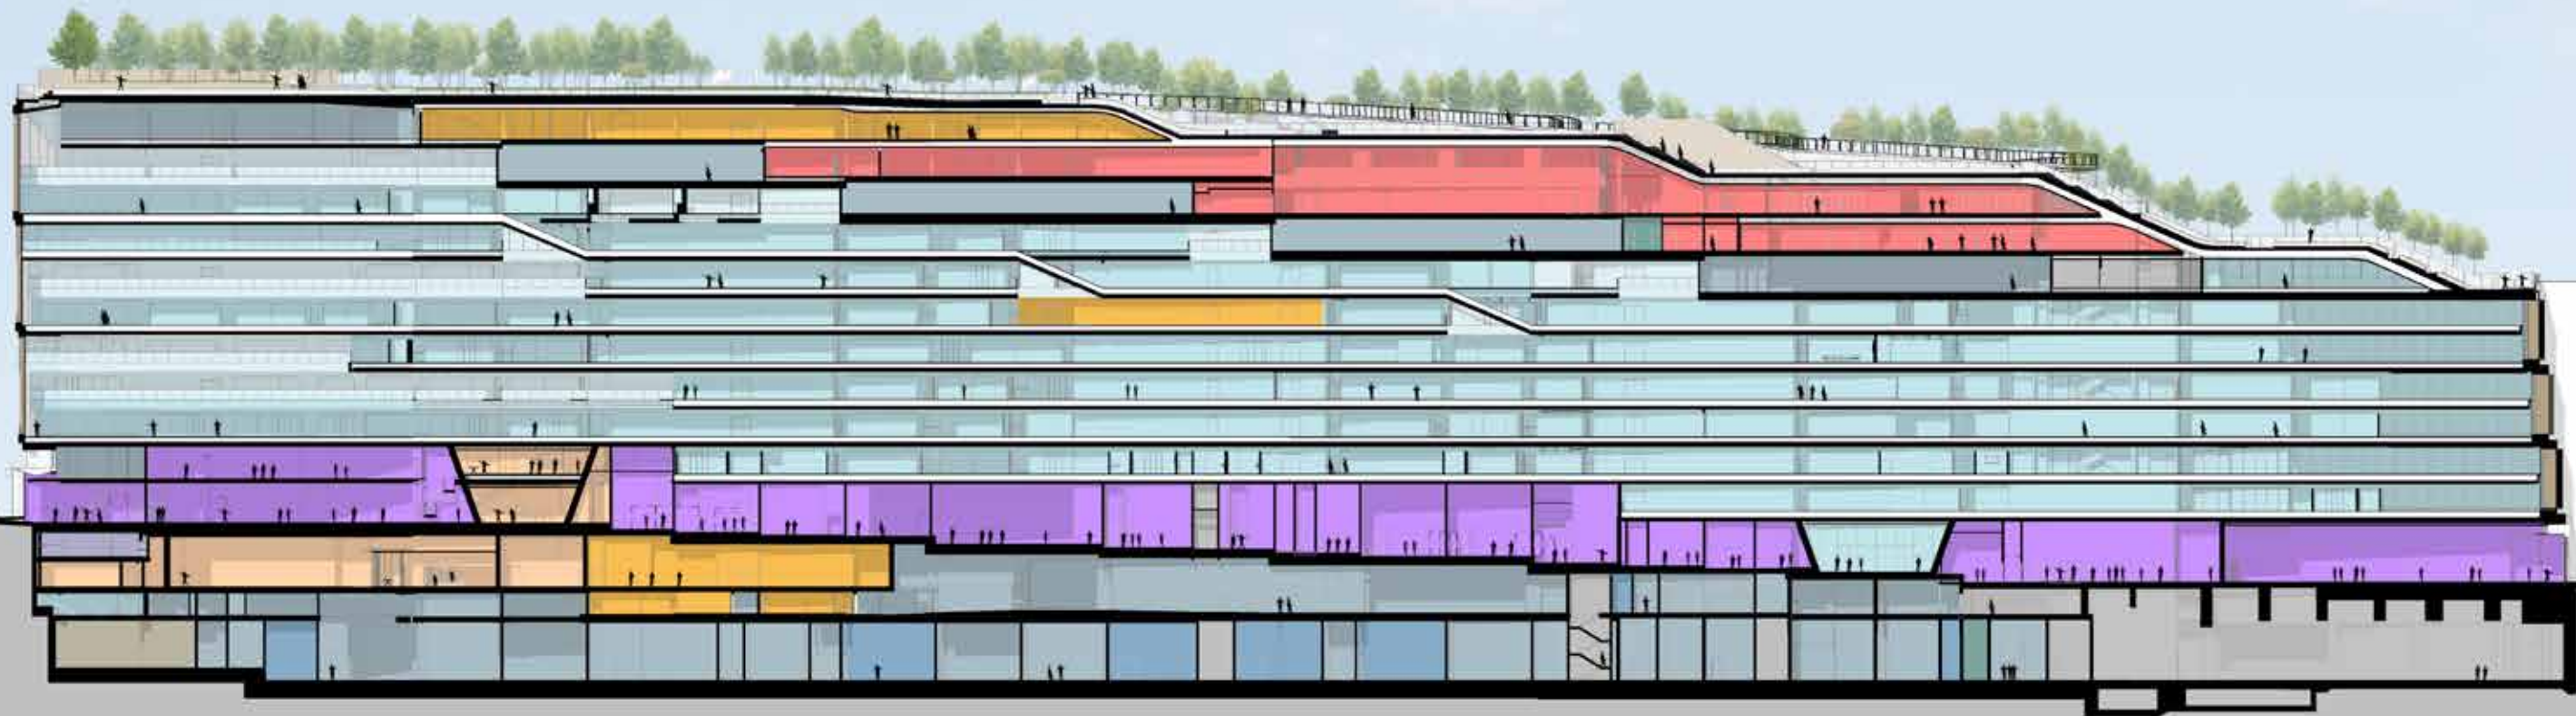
Long section along King's Boulevard, looking east. Retail frontage is shown in purple and demonstrates the slope down from Goods Way to Battle Bridge Place across Levels 00 and 01.
